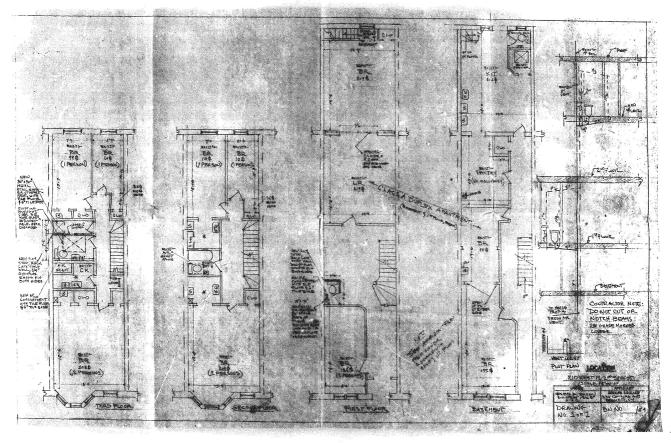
1970s plan of 210 West, 122<sup>nd</sup> Street
